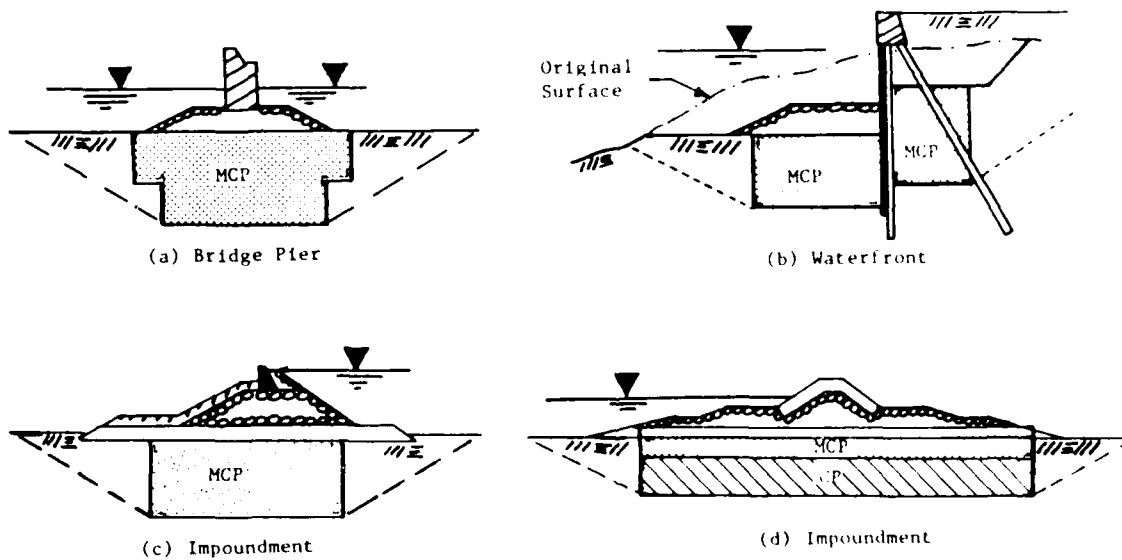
Typical application of the mammoth pile method ("Mammoth Composer System," Fudo Construction Co., anonymous (undated), Tokyo, Japan)
